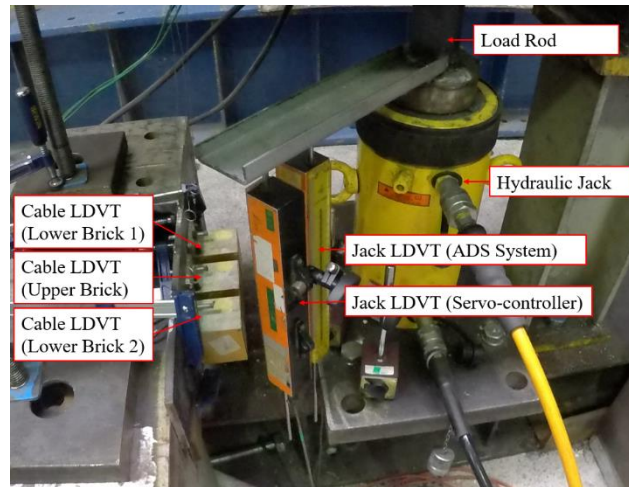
Slip test instrumentation: LVDTs – Details
